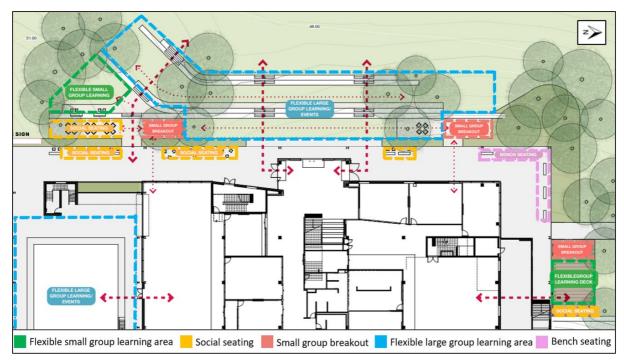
| Lower Ground Floor landscaping and outdoor learning spaces (Source: Applicant's RtS)
